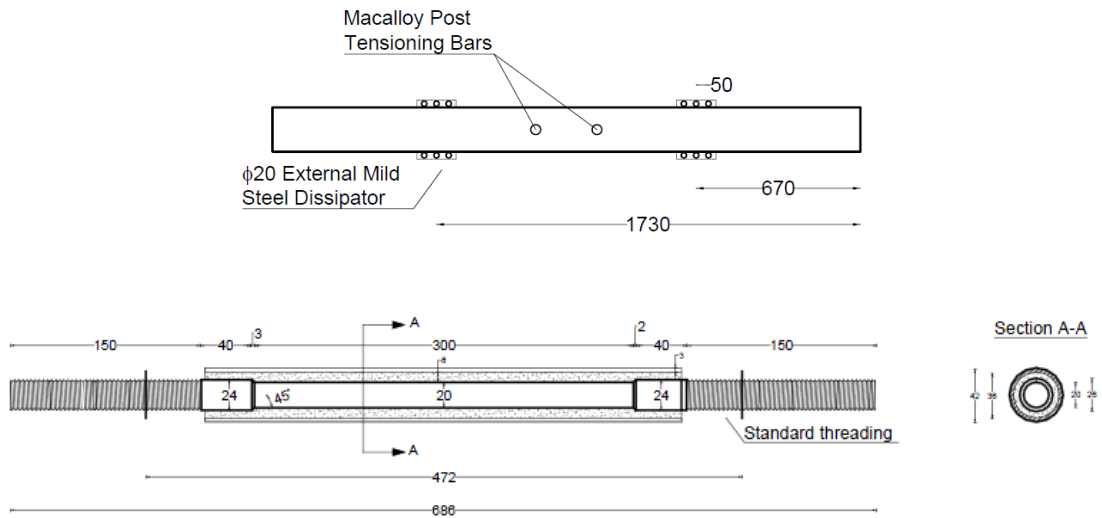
Post Tensioned Wall Section with $\phi 20$ External Mild Steel Dissipators
